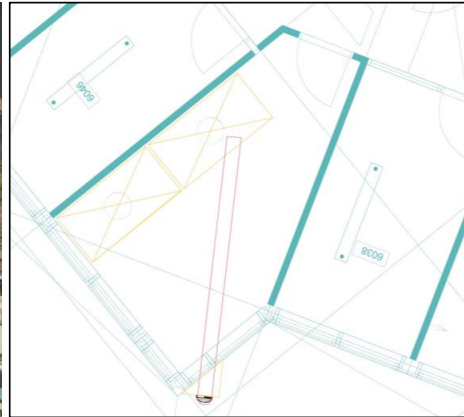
Office plan, windows on the southwest wall, horizontal daylight tube (red lines) was installed 45° from the southeast wall, with entrance nearly oriented against south
